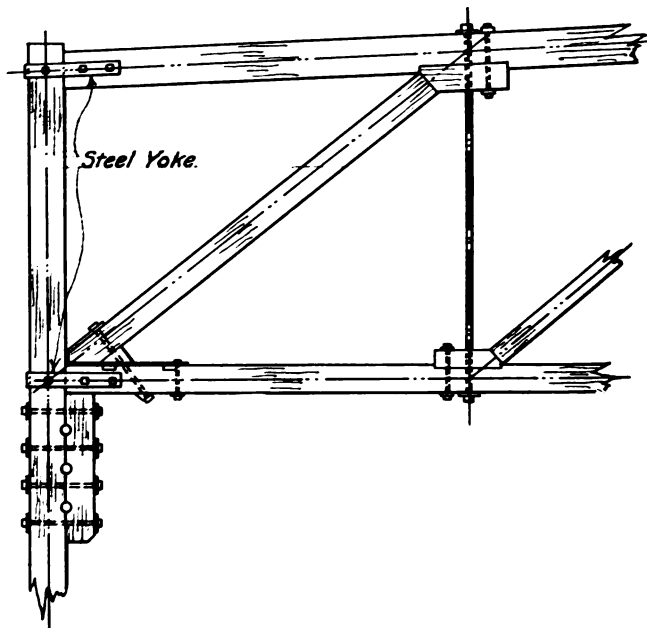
POORLY DESIGNED TRUSS AND POST CONNECTION.
